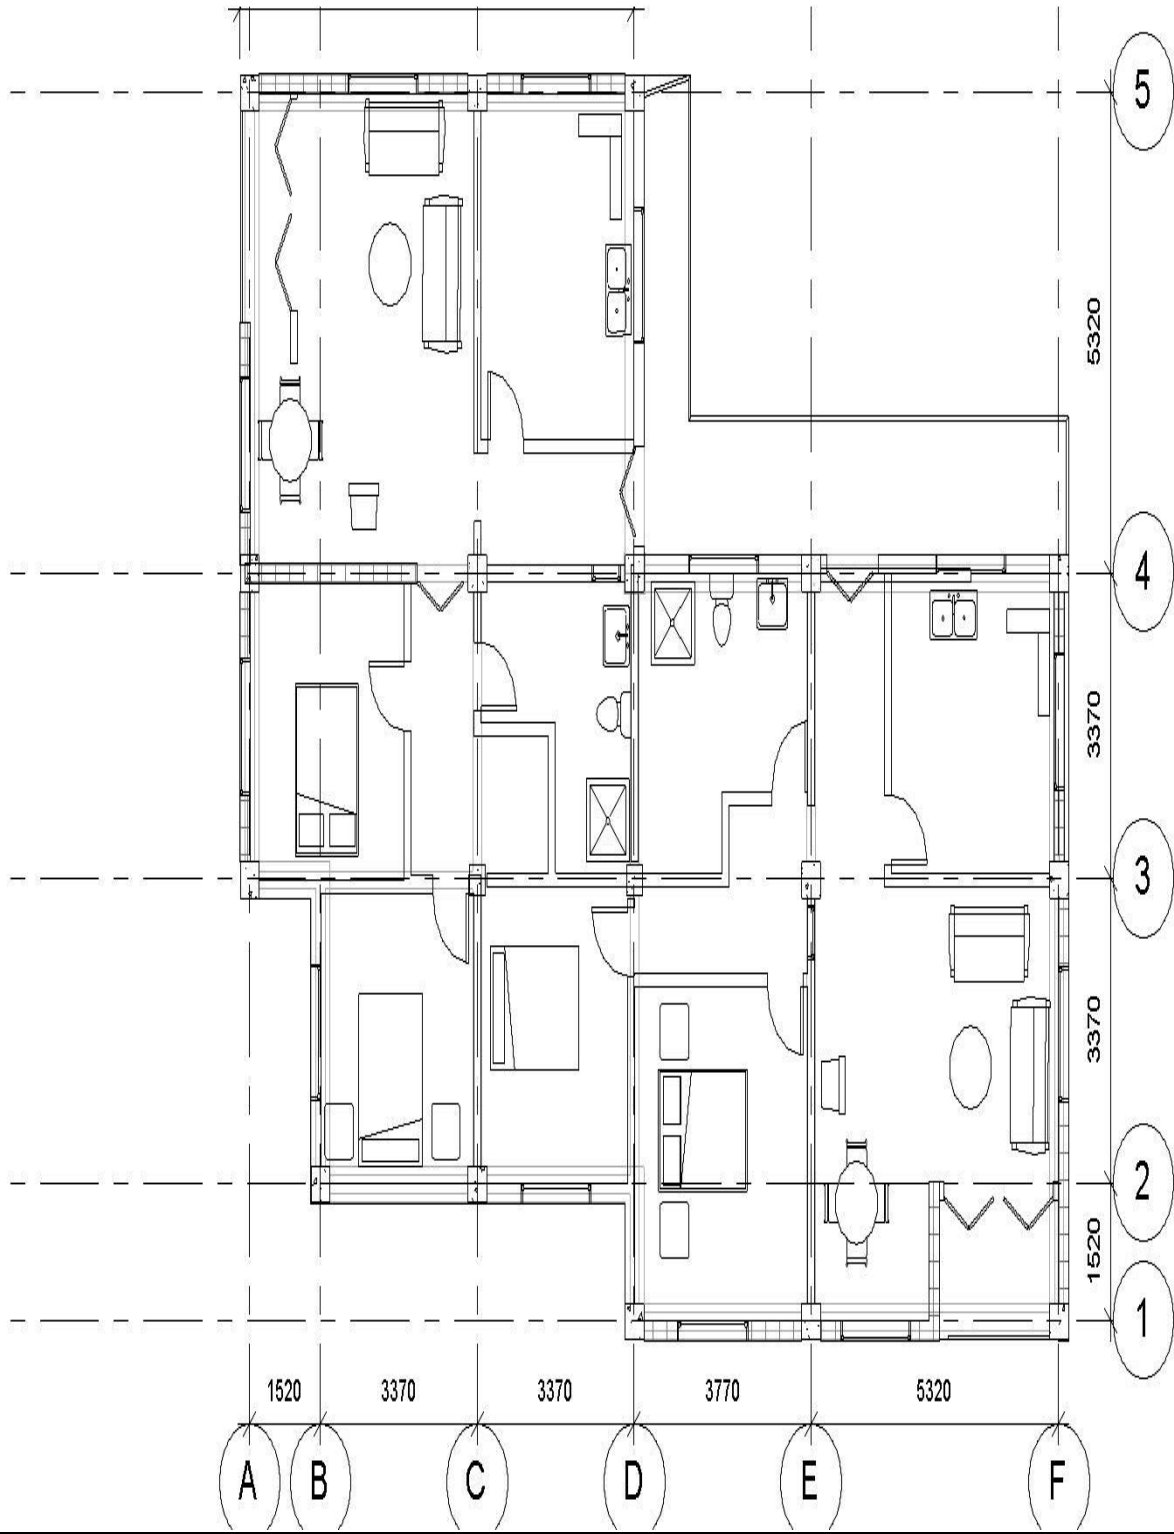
Typical Architectural Floor Plan in Revit Architecture (1<sup>st</sup>-4<sup>th</sup> floor)
